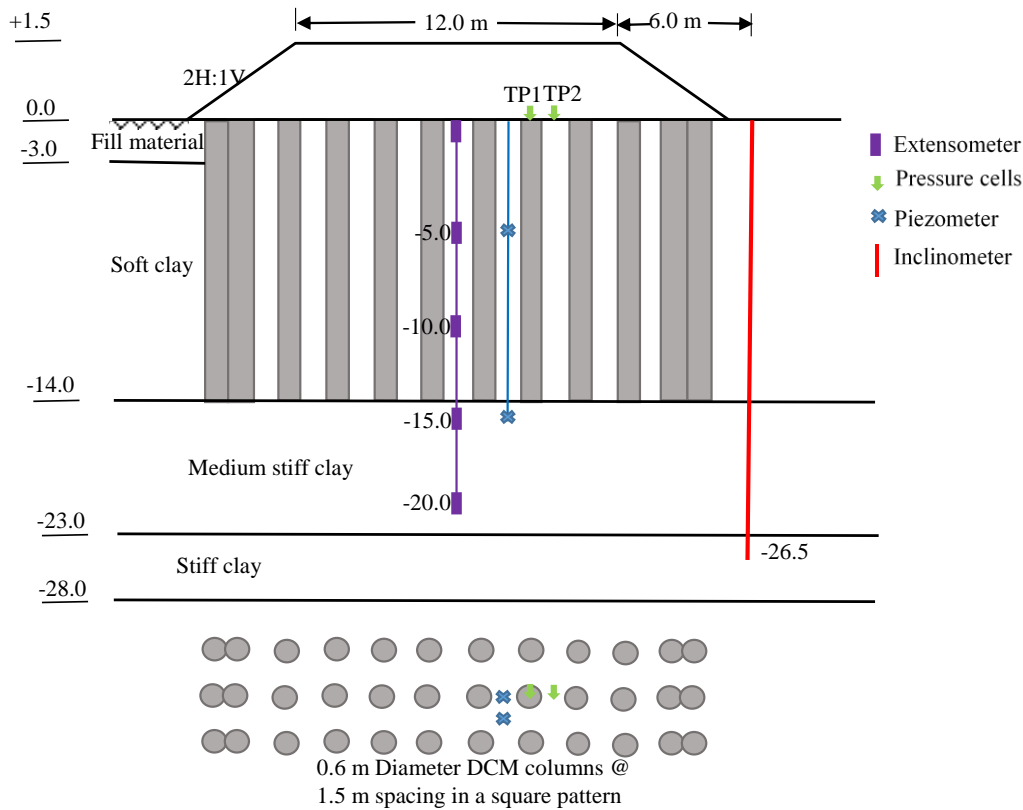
DCM column-supported embankment with instrumentation (a) Cross-section and (b) Plan views
